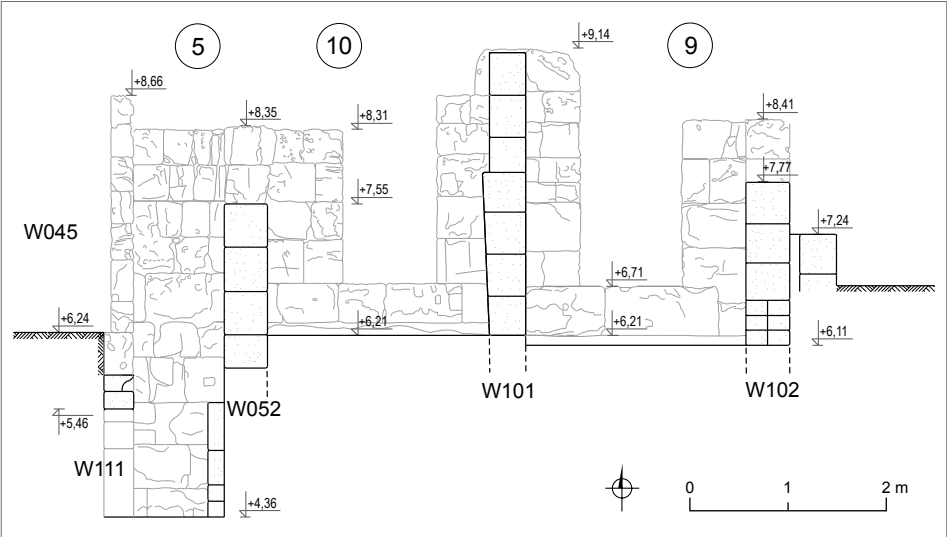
Rooms FA-9 and FA-10, east-west cross section (PCMA UW | drawing M. Polak)
